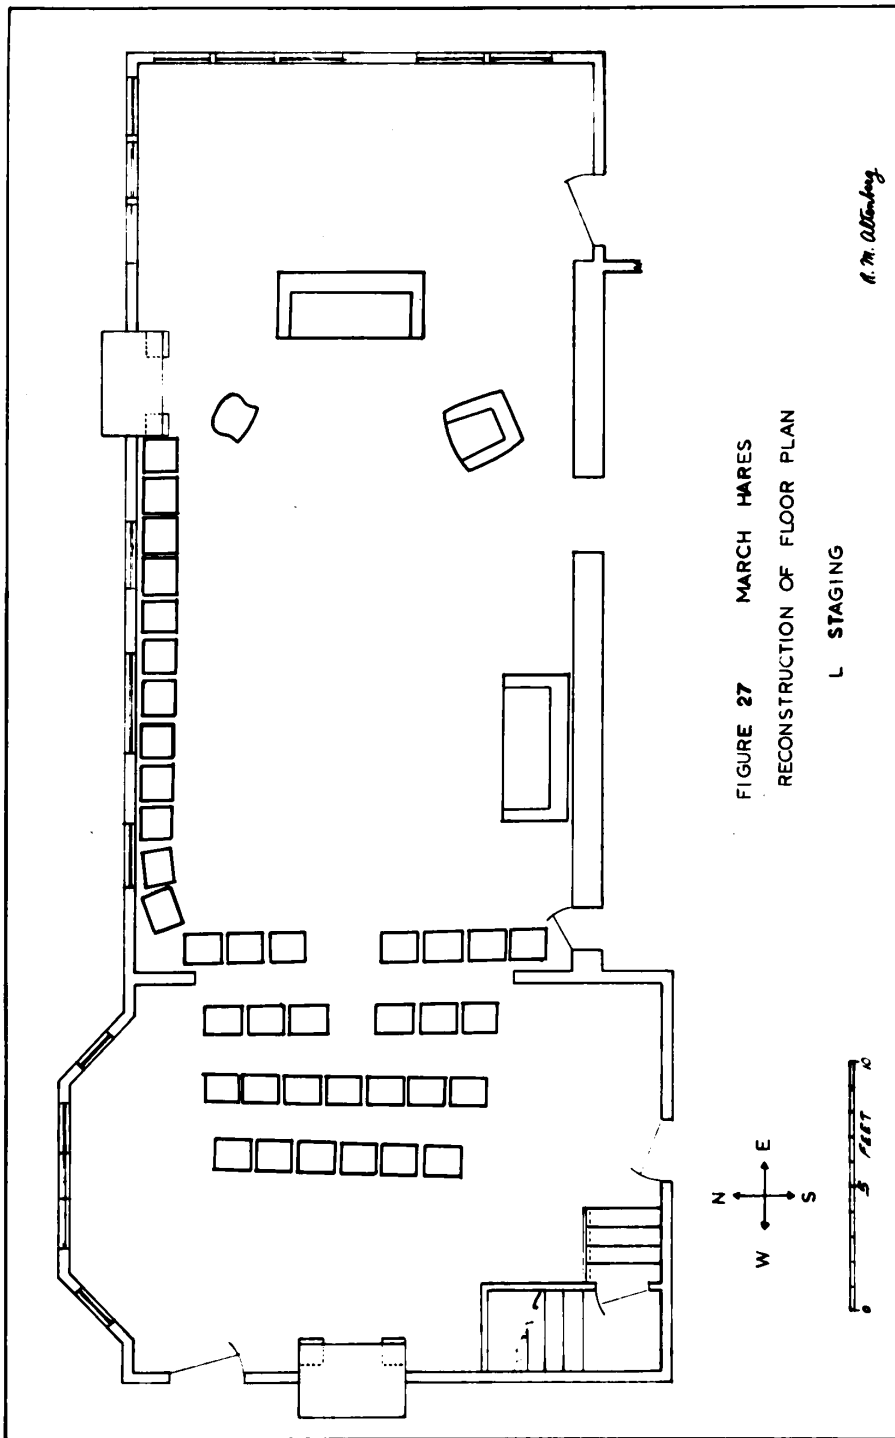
Reconstruction of L staging floor plan, *March Hares*.
